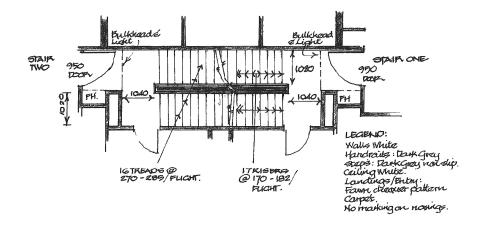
Dimensioned plan view of scissor stairs - Building M1
